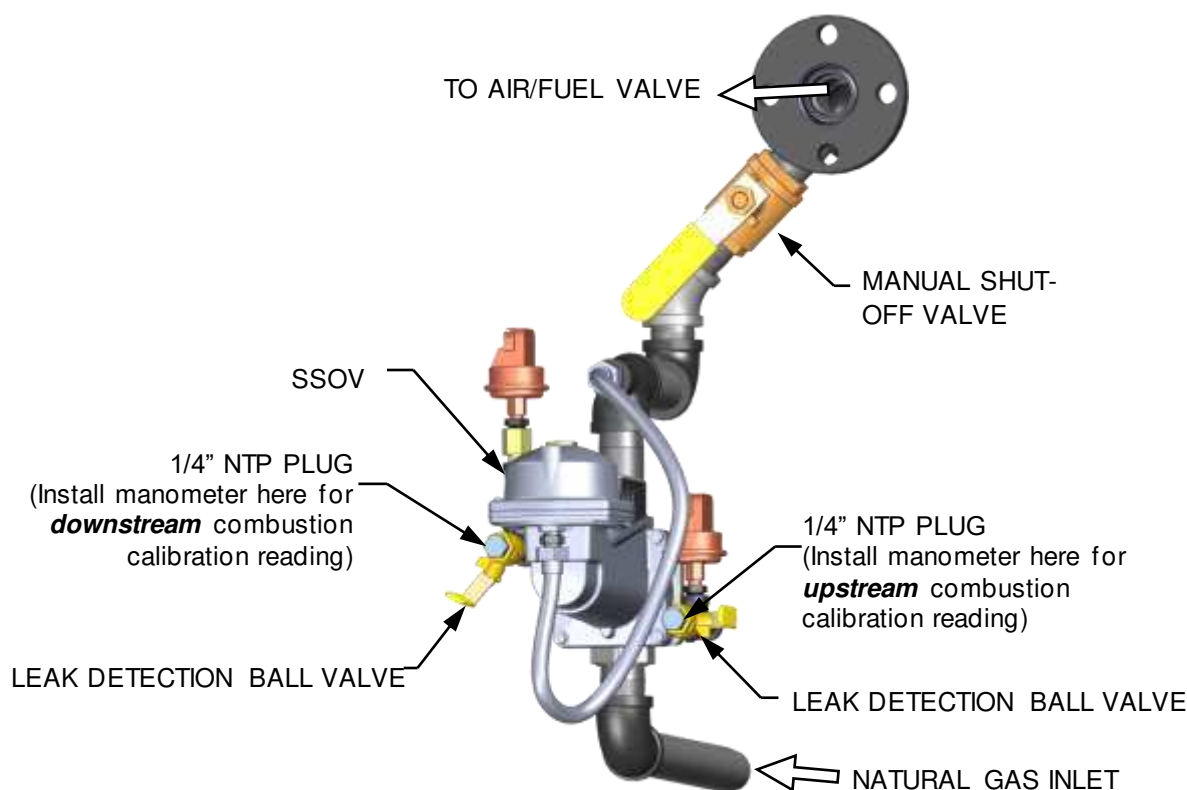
1/4 Inch Gas Plug Location – BMK750 & 1000 (P/N 22322 shown)
